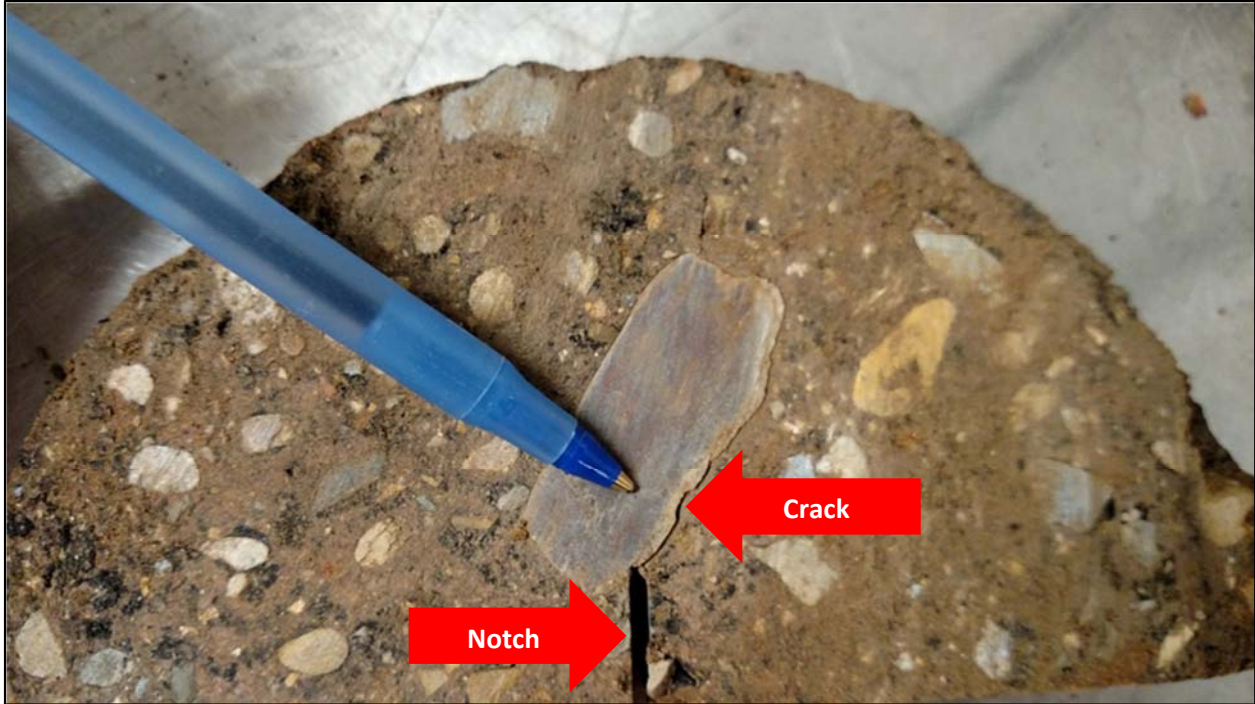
Cracking from Semi-Circular Bend Test (photo: Henrichs)
